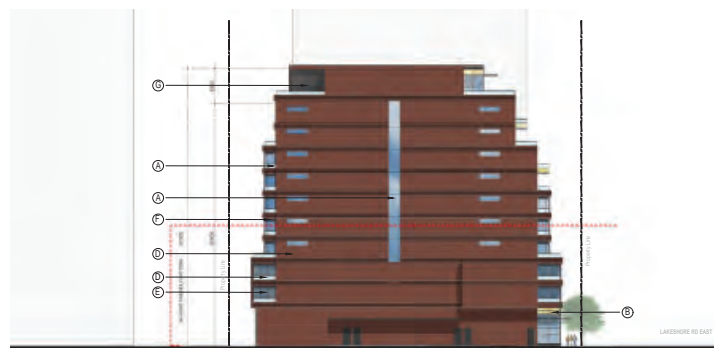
West Elevation, facing adjacent lot, with clerestory windows and stairwell fenestrations to ensure privacy
